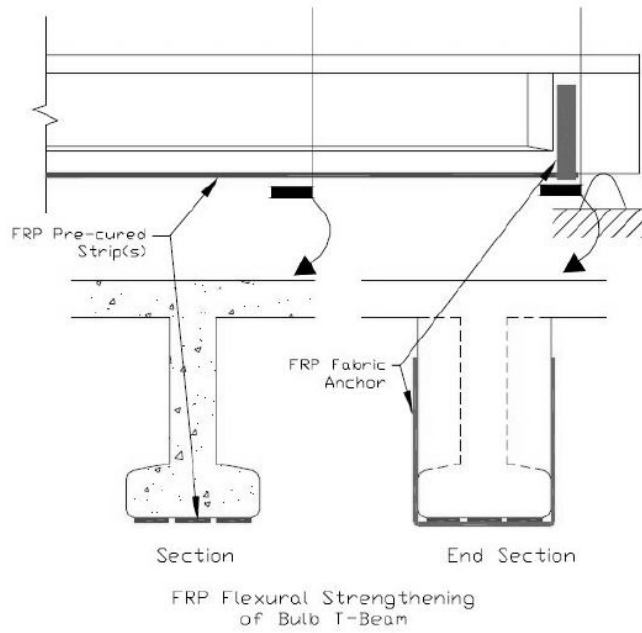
Typical Flexural Strengthening of AASHTO-Type Girder Bridge
